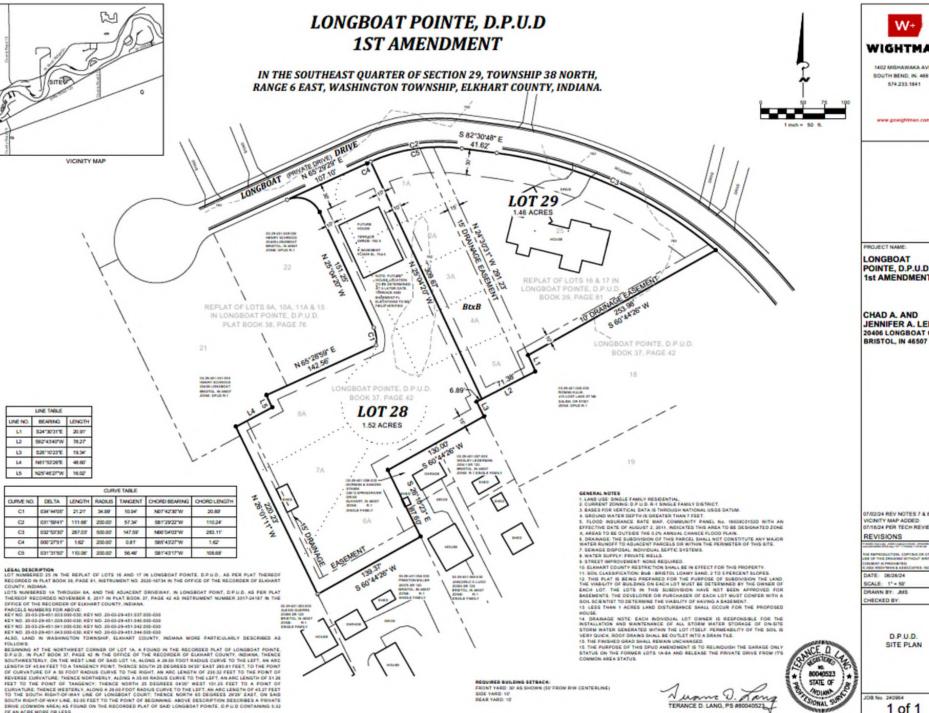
Detailed PUD Amendment - Rezoning, Plat & Site Plan
